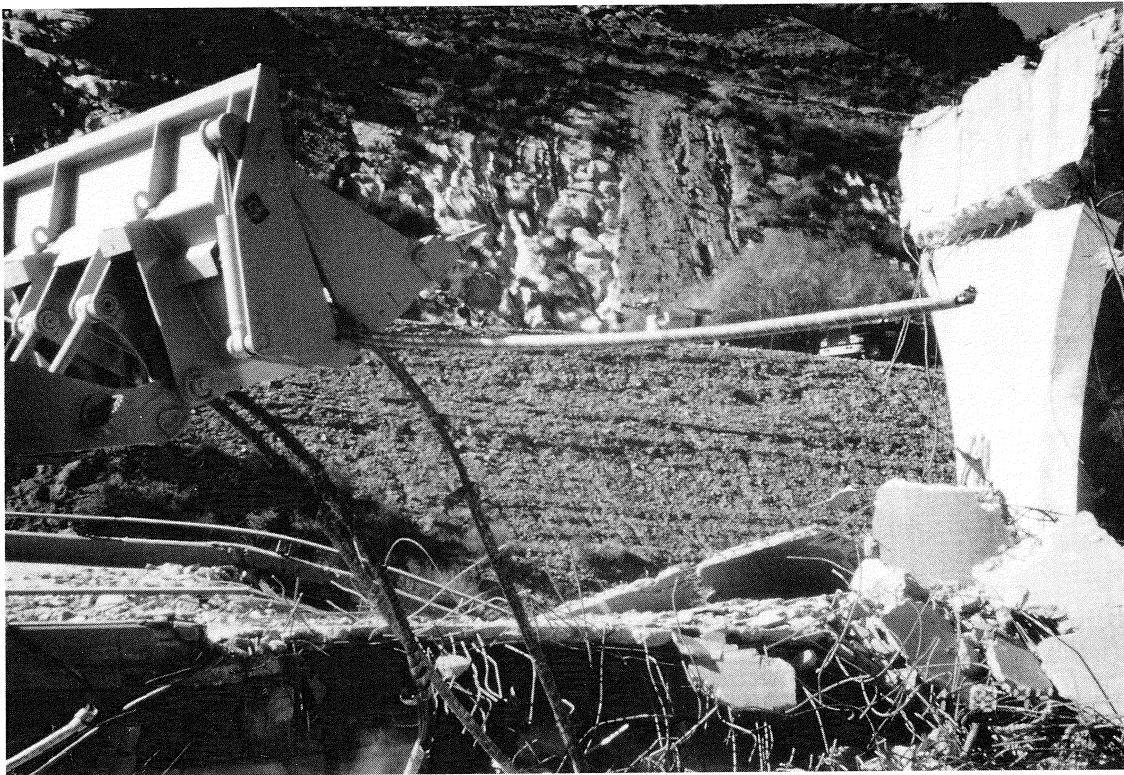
SR14/I-5 Separation and Overhead (Southbound) - Equalizing Bolt and Restrainers at Hinge in Span 3
